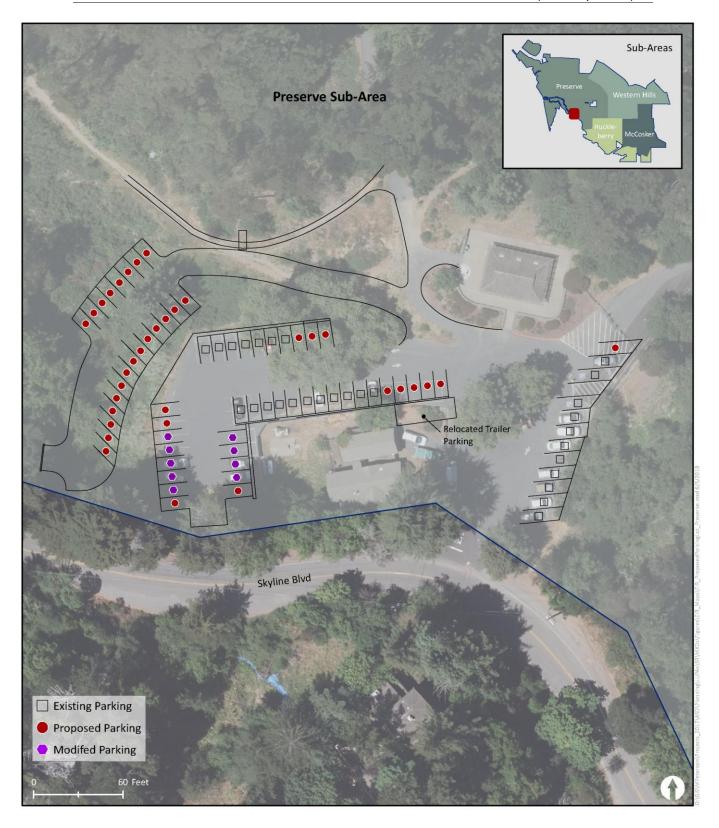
PROPOSED PARKING LAYOUT, MAIN SIBLEY STAGING AREA. PRESERVE SUB-AREA
